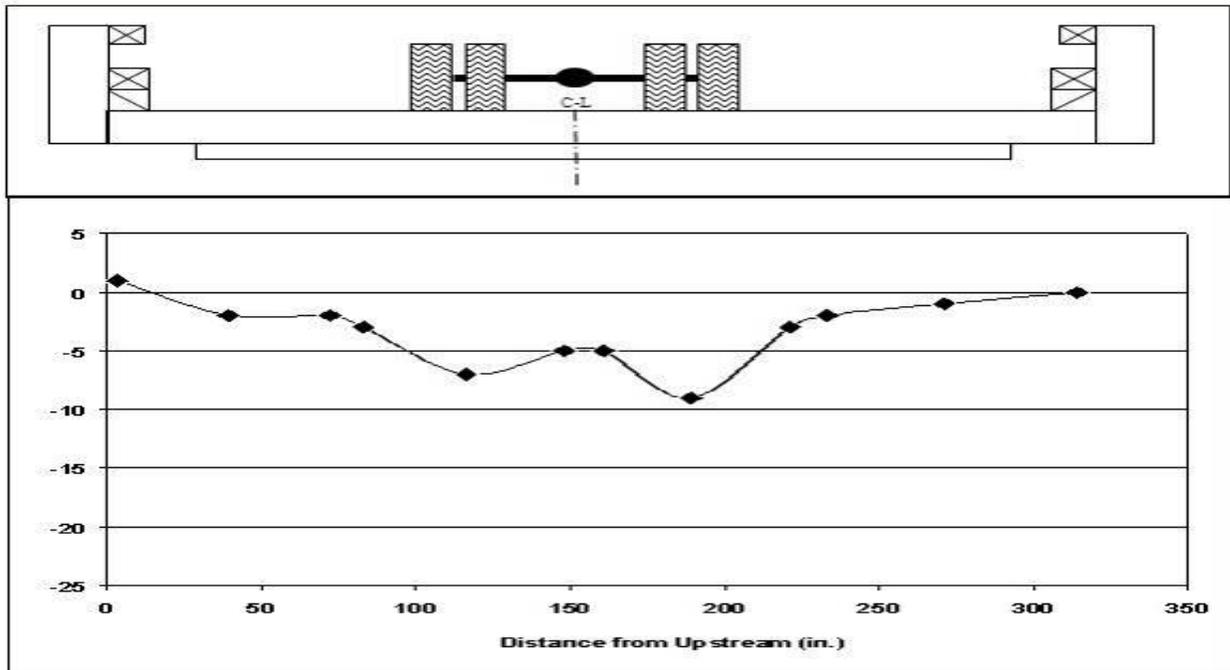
Deflection of span 1 of Bridge 313 for center loading.
